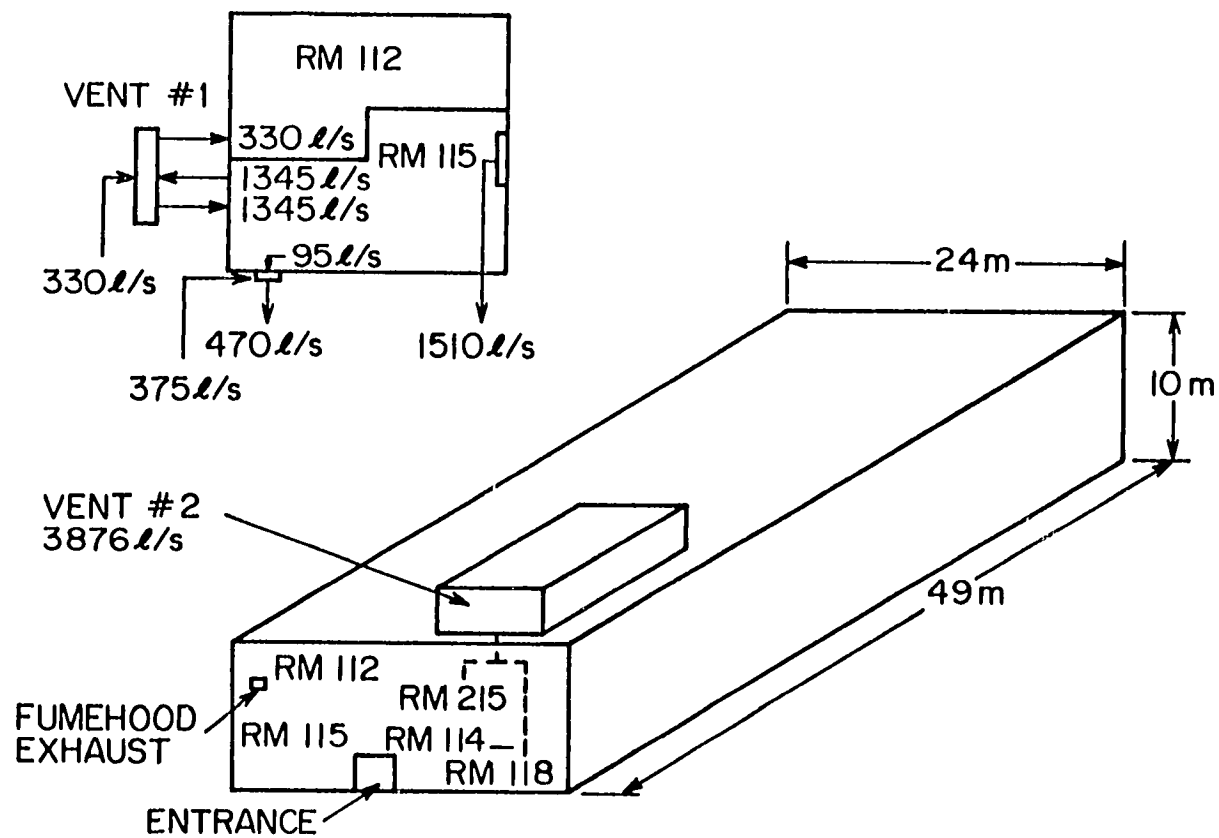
General plan of test building indicating ventilation rates in rooms of interest.
